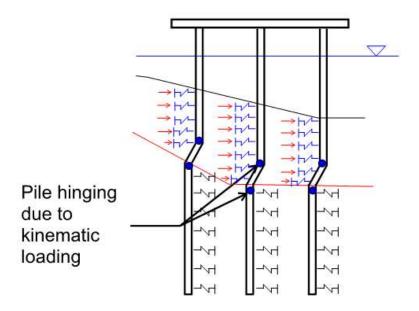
Typical Pile Hinge Locations for Kinematic Loading
